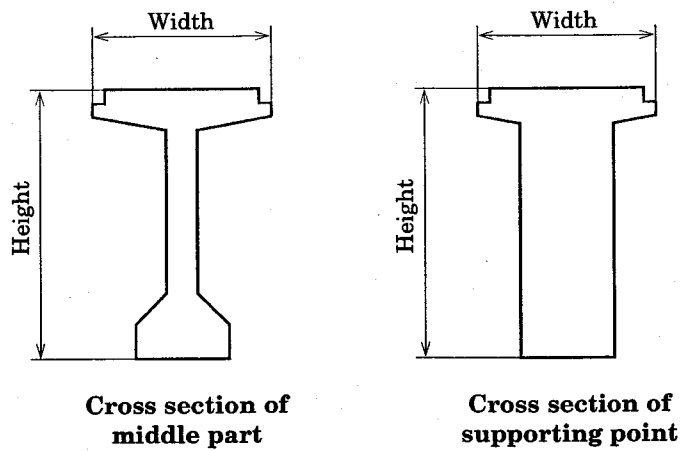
Example of shape of segment of bridge beams for highway bridge
